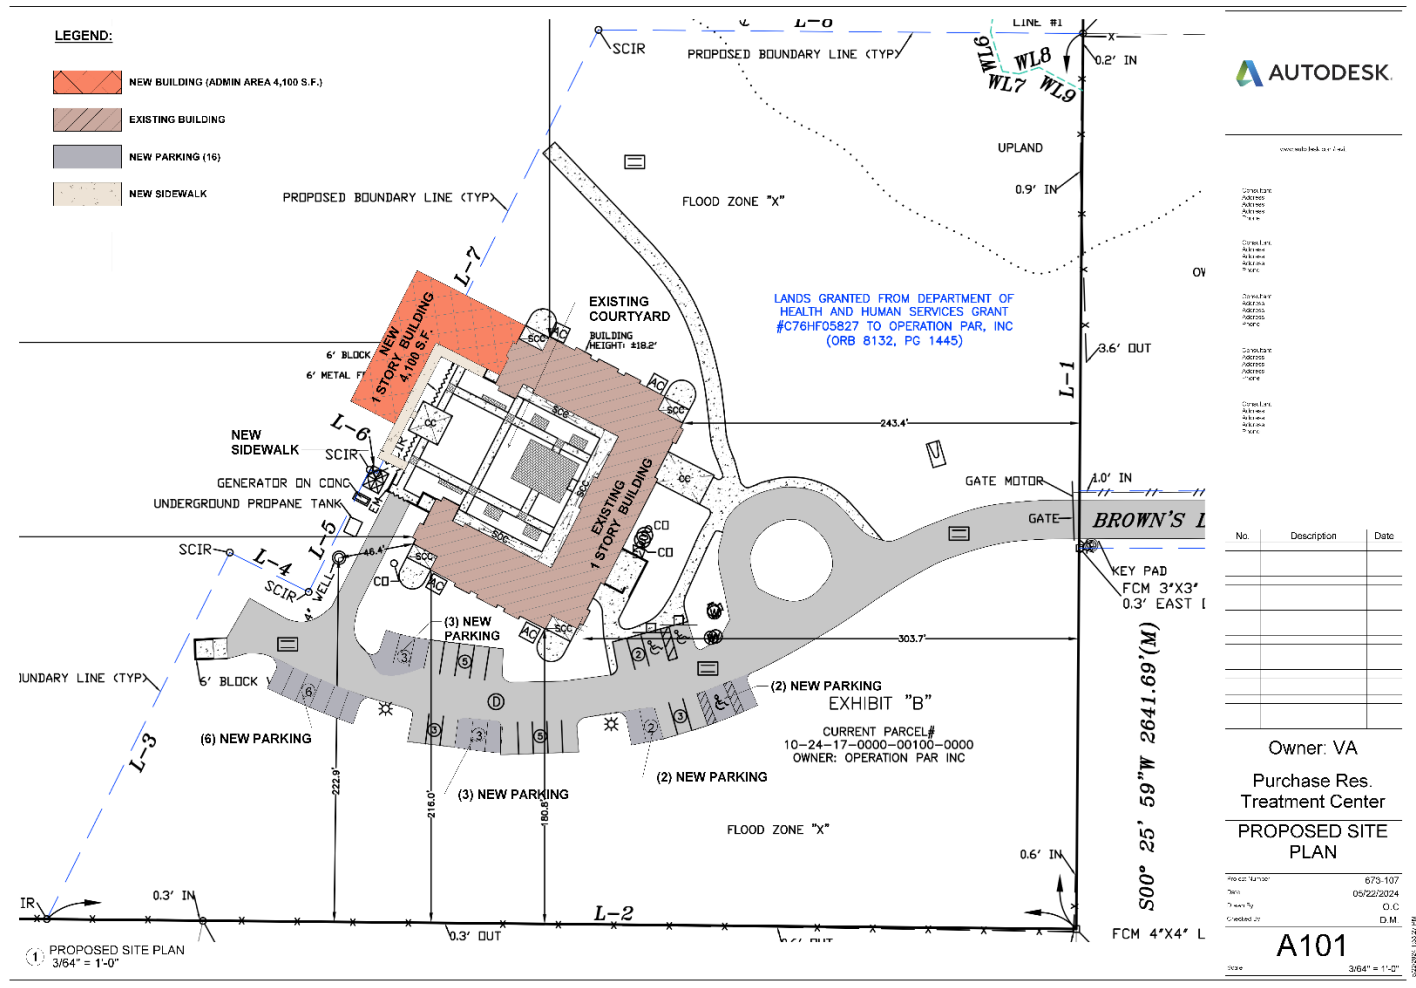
Site development plan showing proposed additional parking and building expansion locations.
